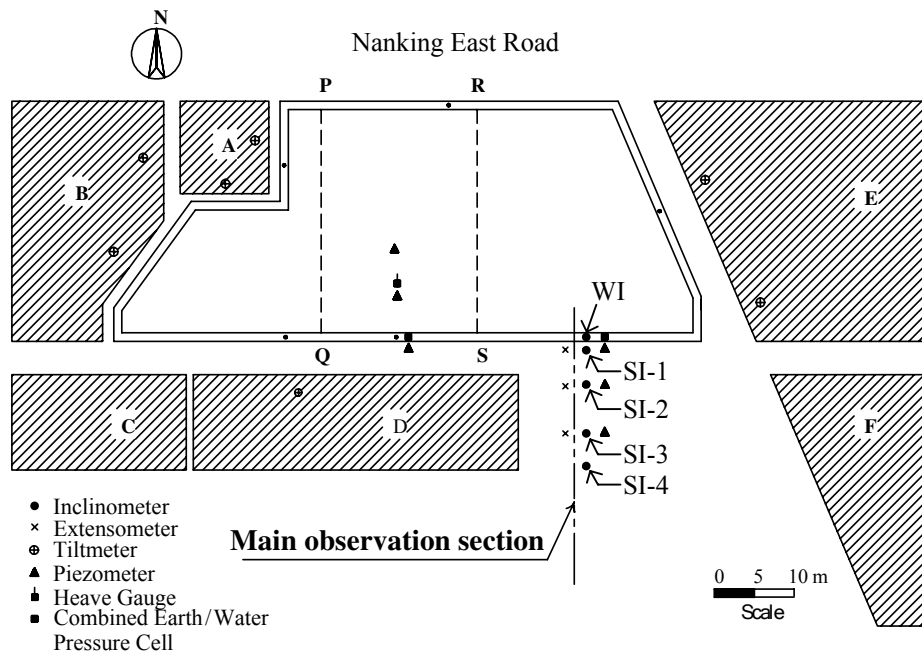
Plan view of the TNEC case and the instrumentation plan
